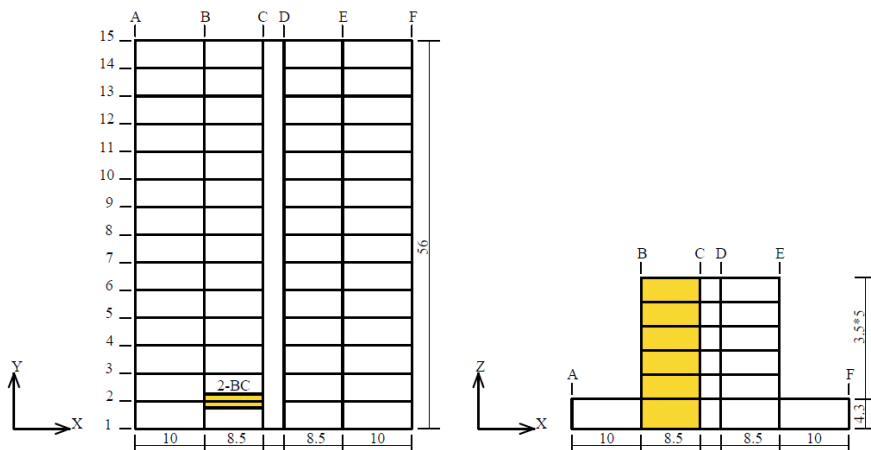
Plan view and elevation of the 6-storey CLT building. Dimensions in [m].
